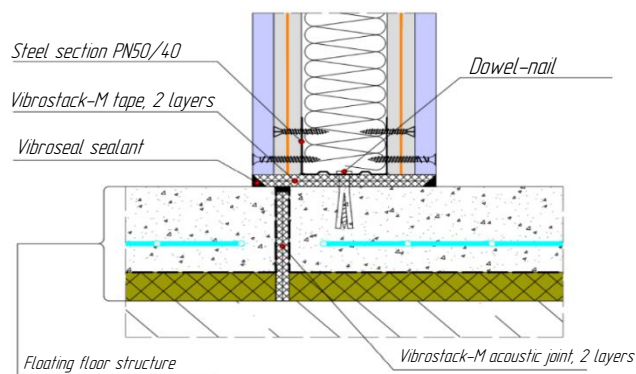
Connection of single-frame soundproofing partition to floating floor structure.
